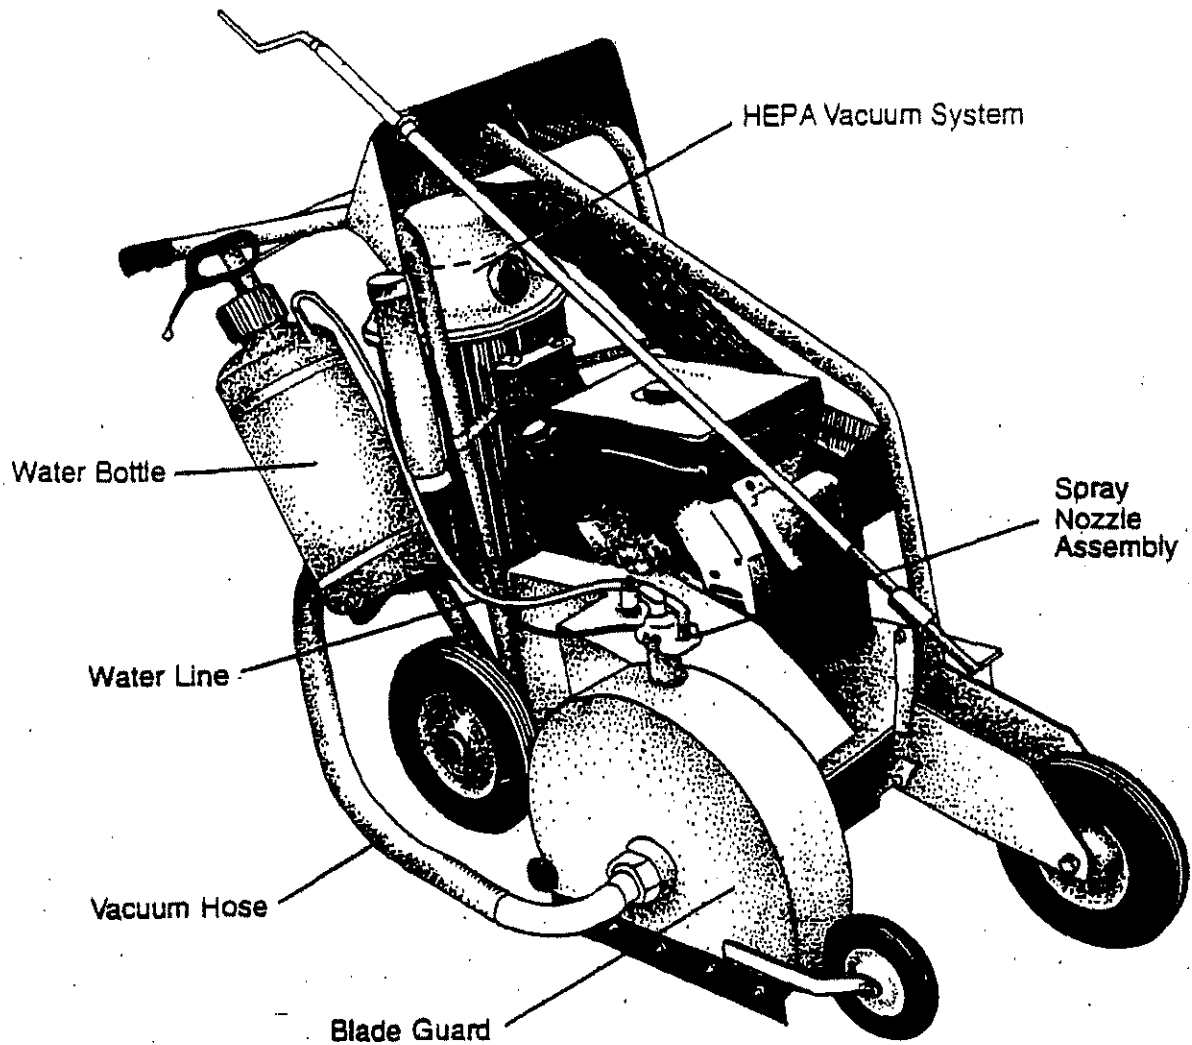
Rotating Blade Roof Cutter Equipped with a Spray Nozzle and Vacuum System
